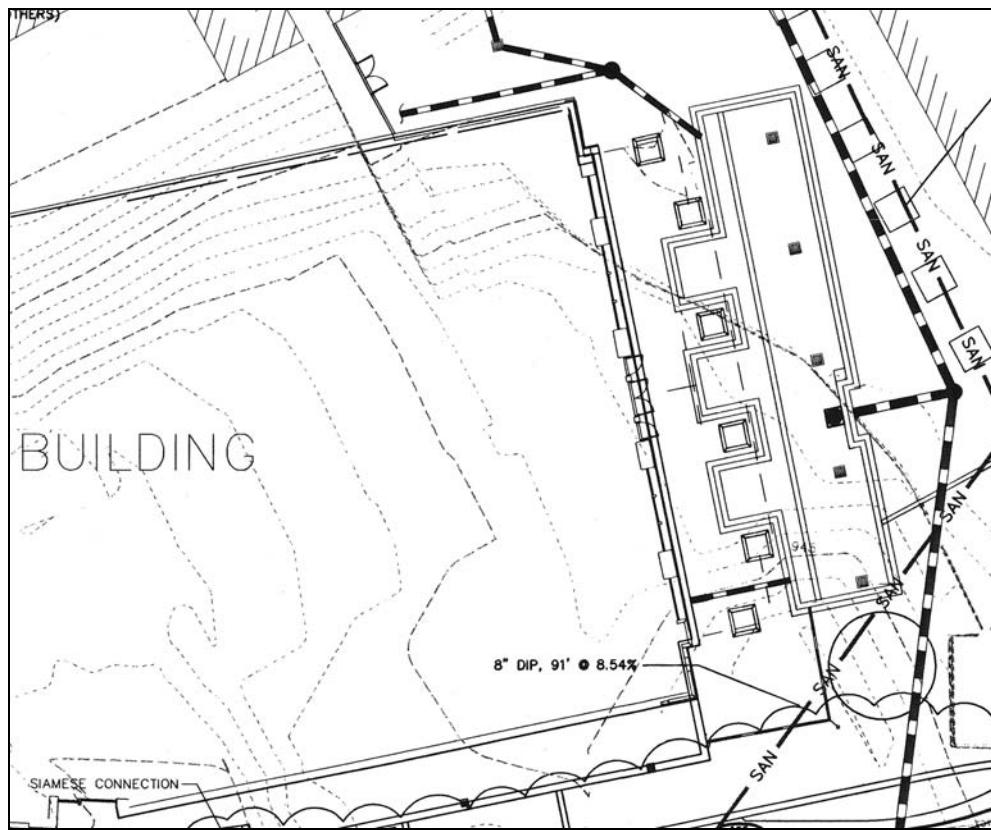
Drawing of ‘crenelated’ plan of cistern at Whitehead Building, Emory University (HOK Architects)
